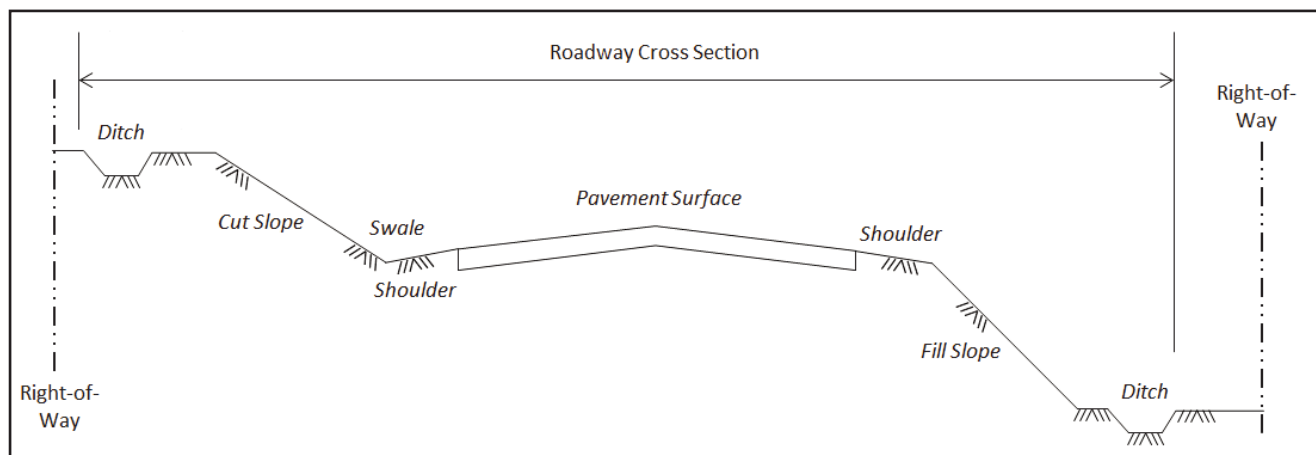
Existing Roadway Cross Section Limits for RMA Determination
